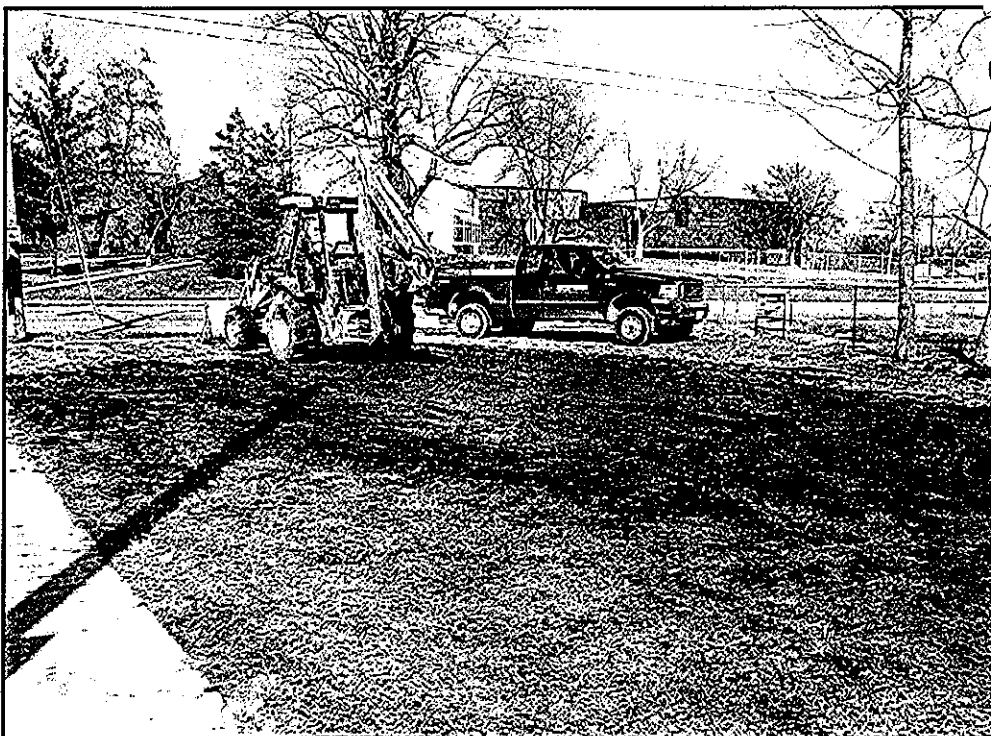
VIEW TOWARD THE NORTH/NORTHEAST OF AREA AT COMPLETION OF EXCAVATION.
